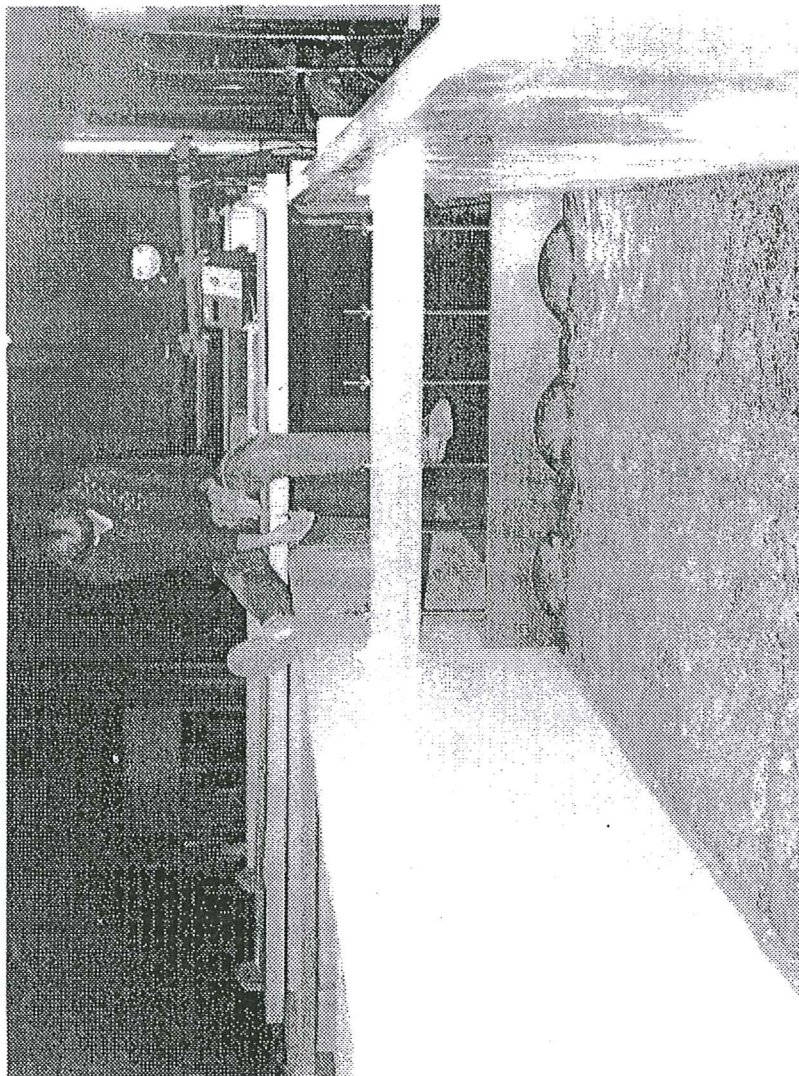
MULTIPLE SEMI-CIRCULAR ARCHED BRIDGE
